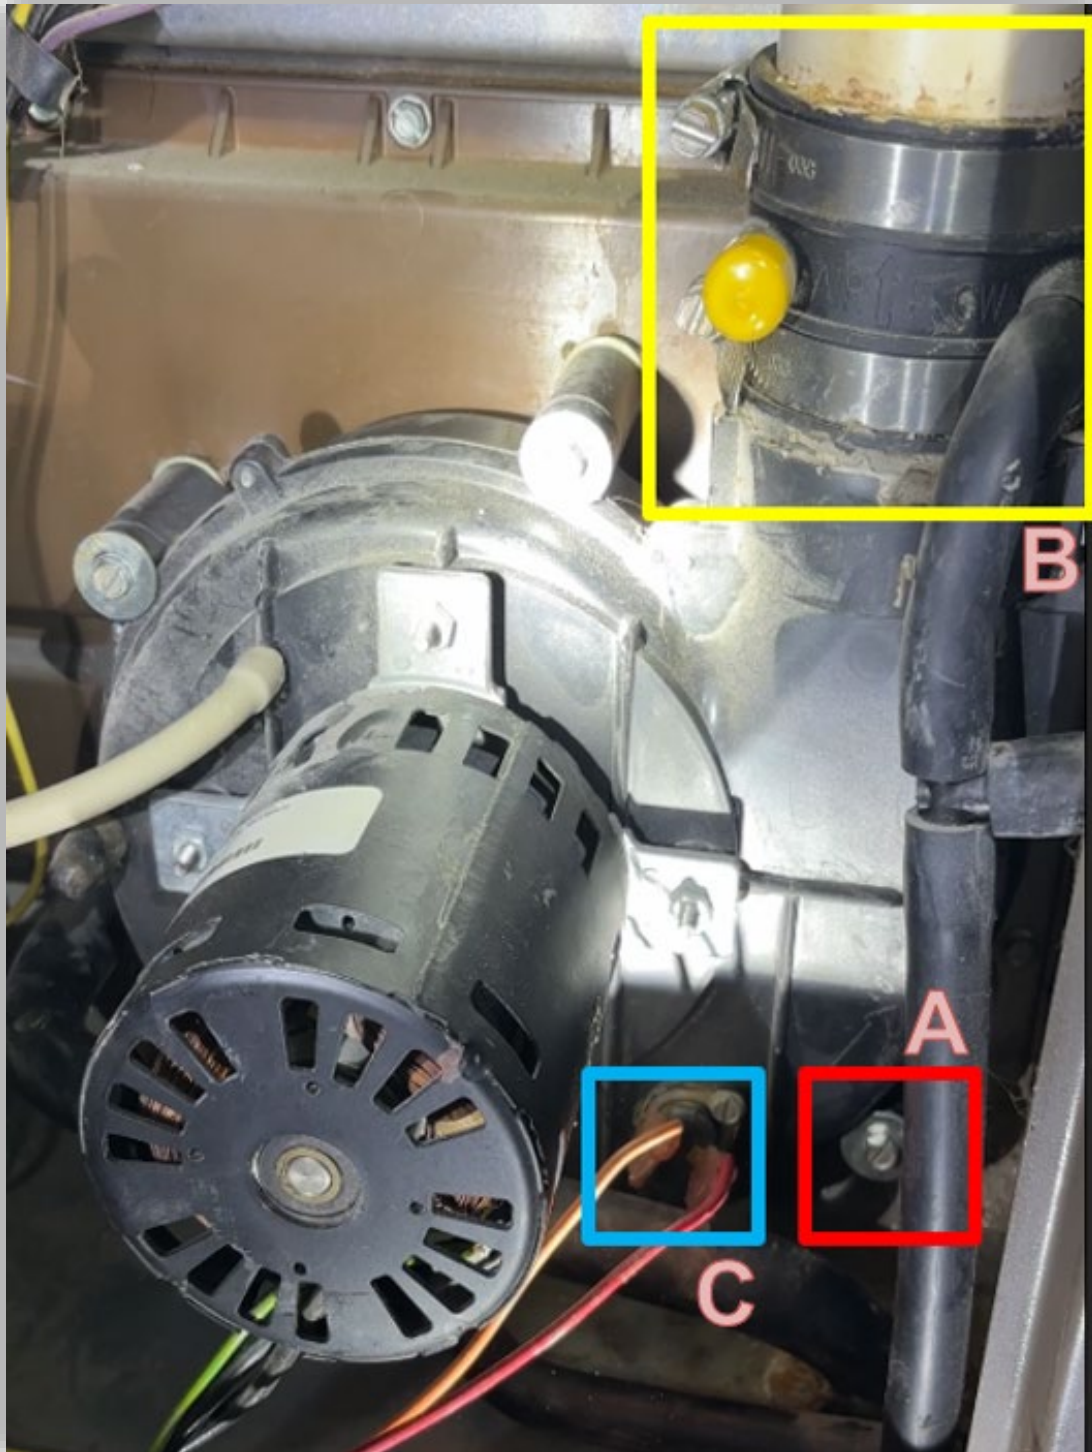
Draft inducer motor showing loose mounting bolts [A] leaking “Fernco” vent pipe coupling [B], and high temperature limit switch [C].
